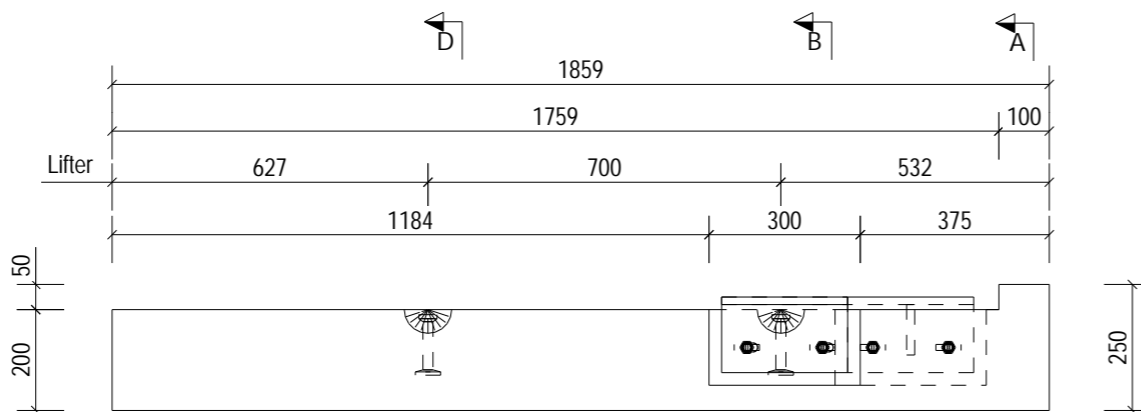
BYL-1462-SL-0003-RC1	Rev: C01
